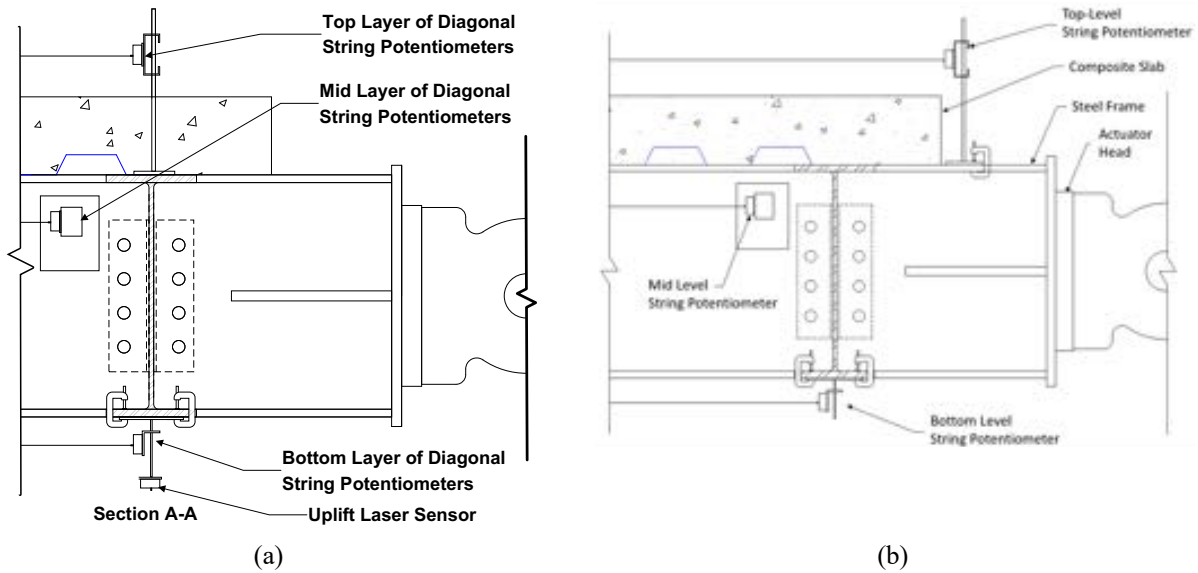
Instrumentation Detail: (a) typical configuration, (b) specimens 3/7.5-4-N-NF-DT and 2/4-4-L-NF-DT
